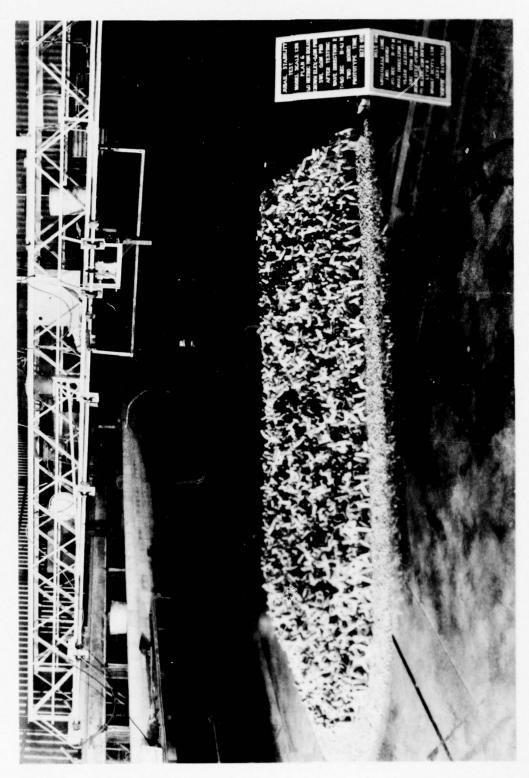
Seaside view of Plan 6 after attack of 9-sec, 4.1-m waves from wave direction 2
